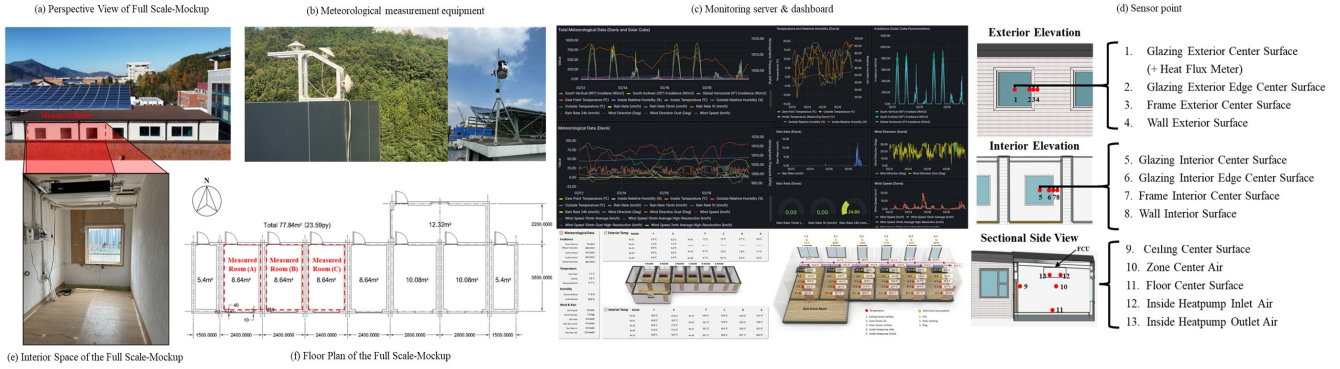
Full-scale mock-up facility, monitoring system, and sensor layout
